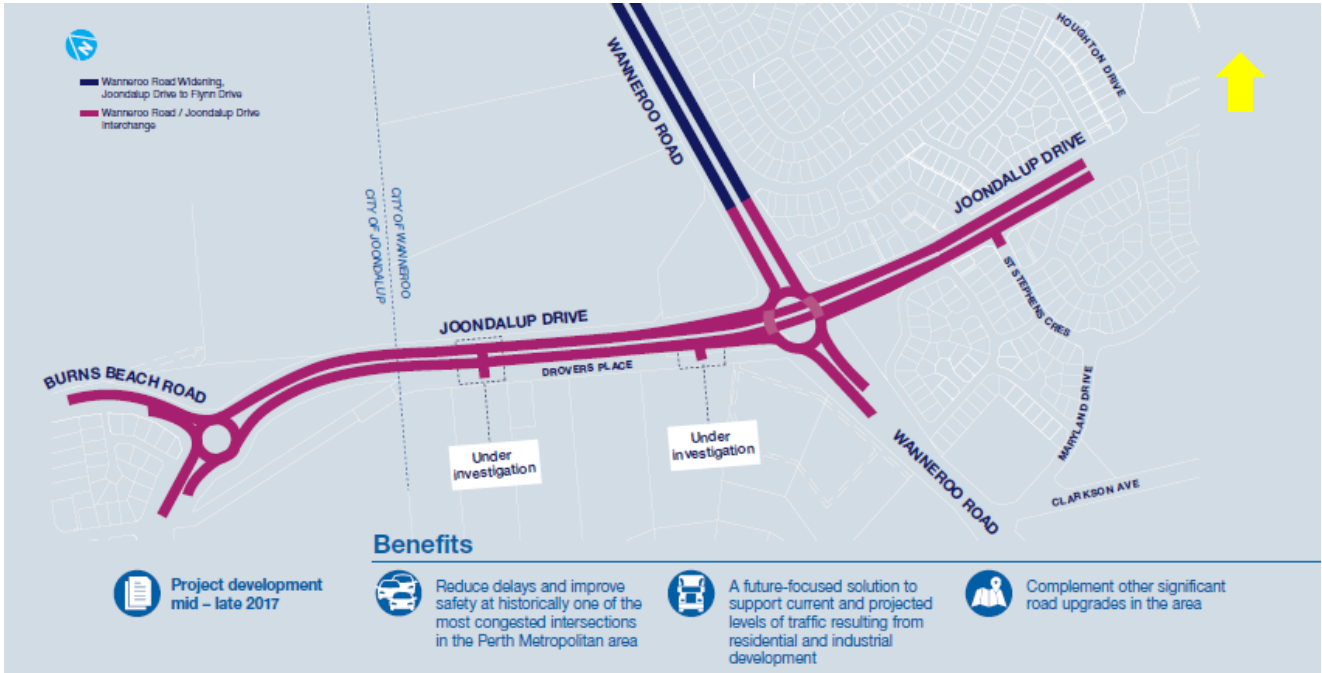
Joondalup Drive and Wanneroo Road intersection modification information sheet excerpt (MRWA October 2017). Subject site identified by yellow arrow.
